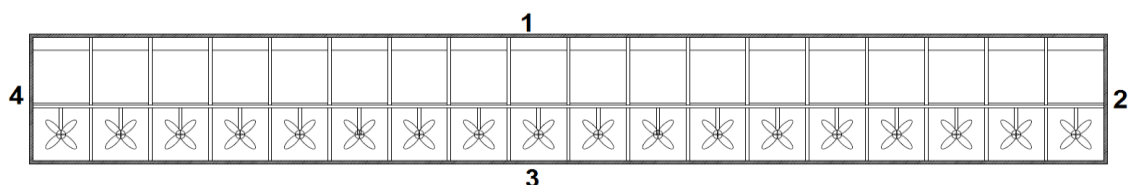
CROSS-SECTION SECTION 1. APPOINTED CONCRETE MEMBERS 1 TO 4
